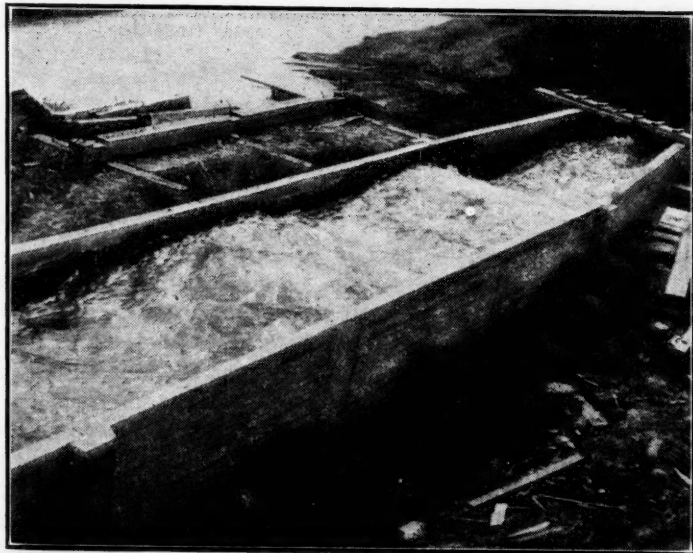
VIEW OF OUTLET, DEEP GULCH SIPHON.
